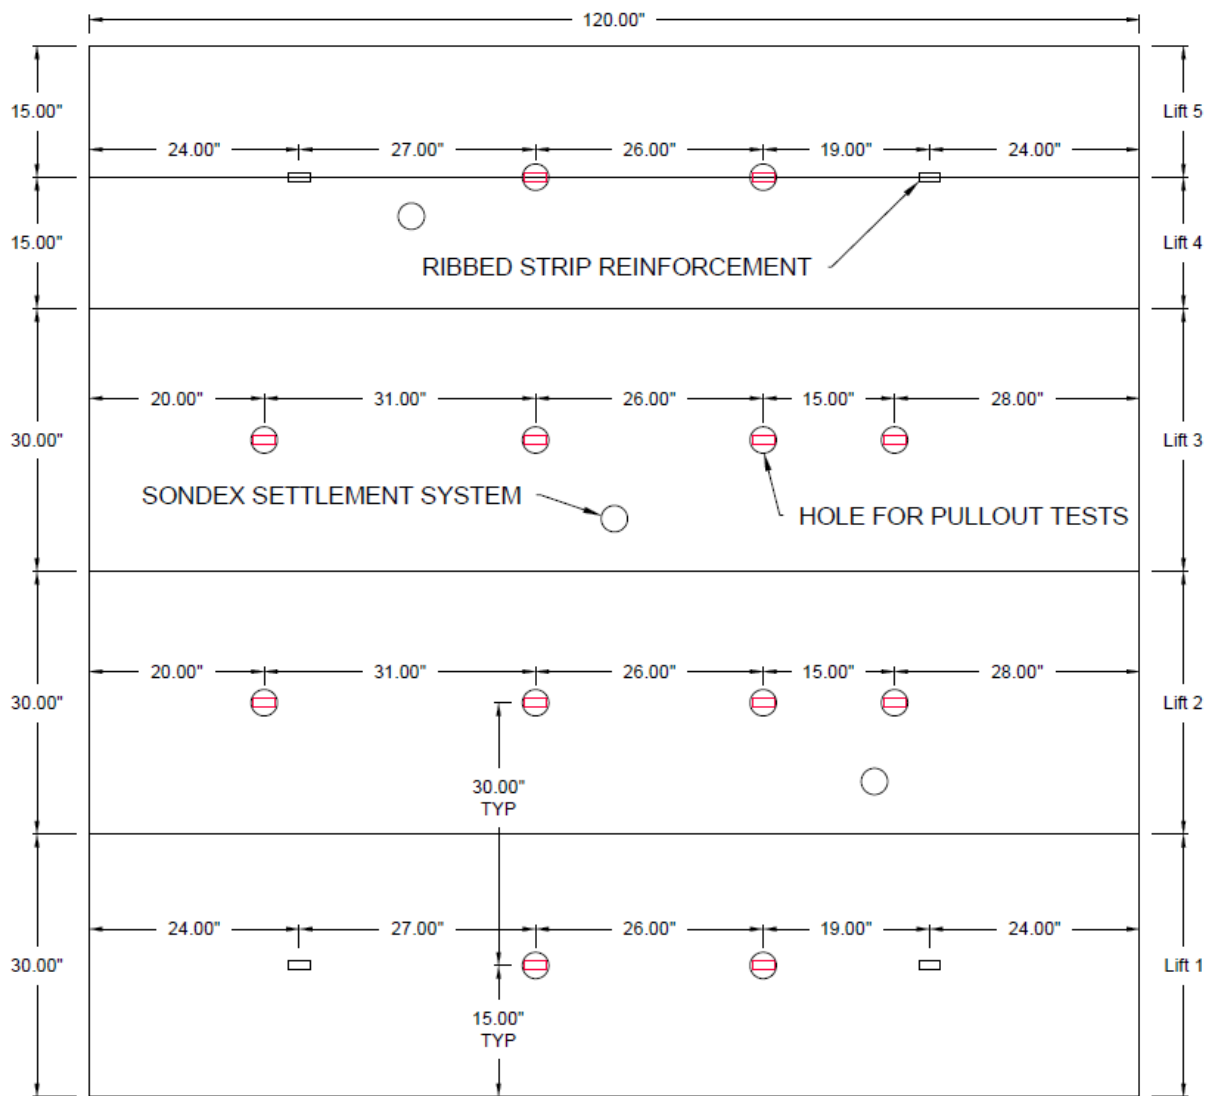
Elevation view showing the arrangement of pull-out reinforcements (shown in red) located in the west wall of LCC for Test 6.
